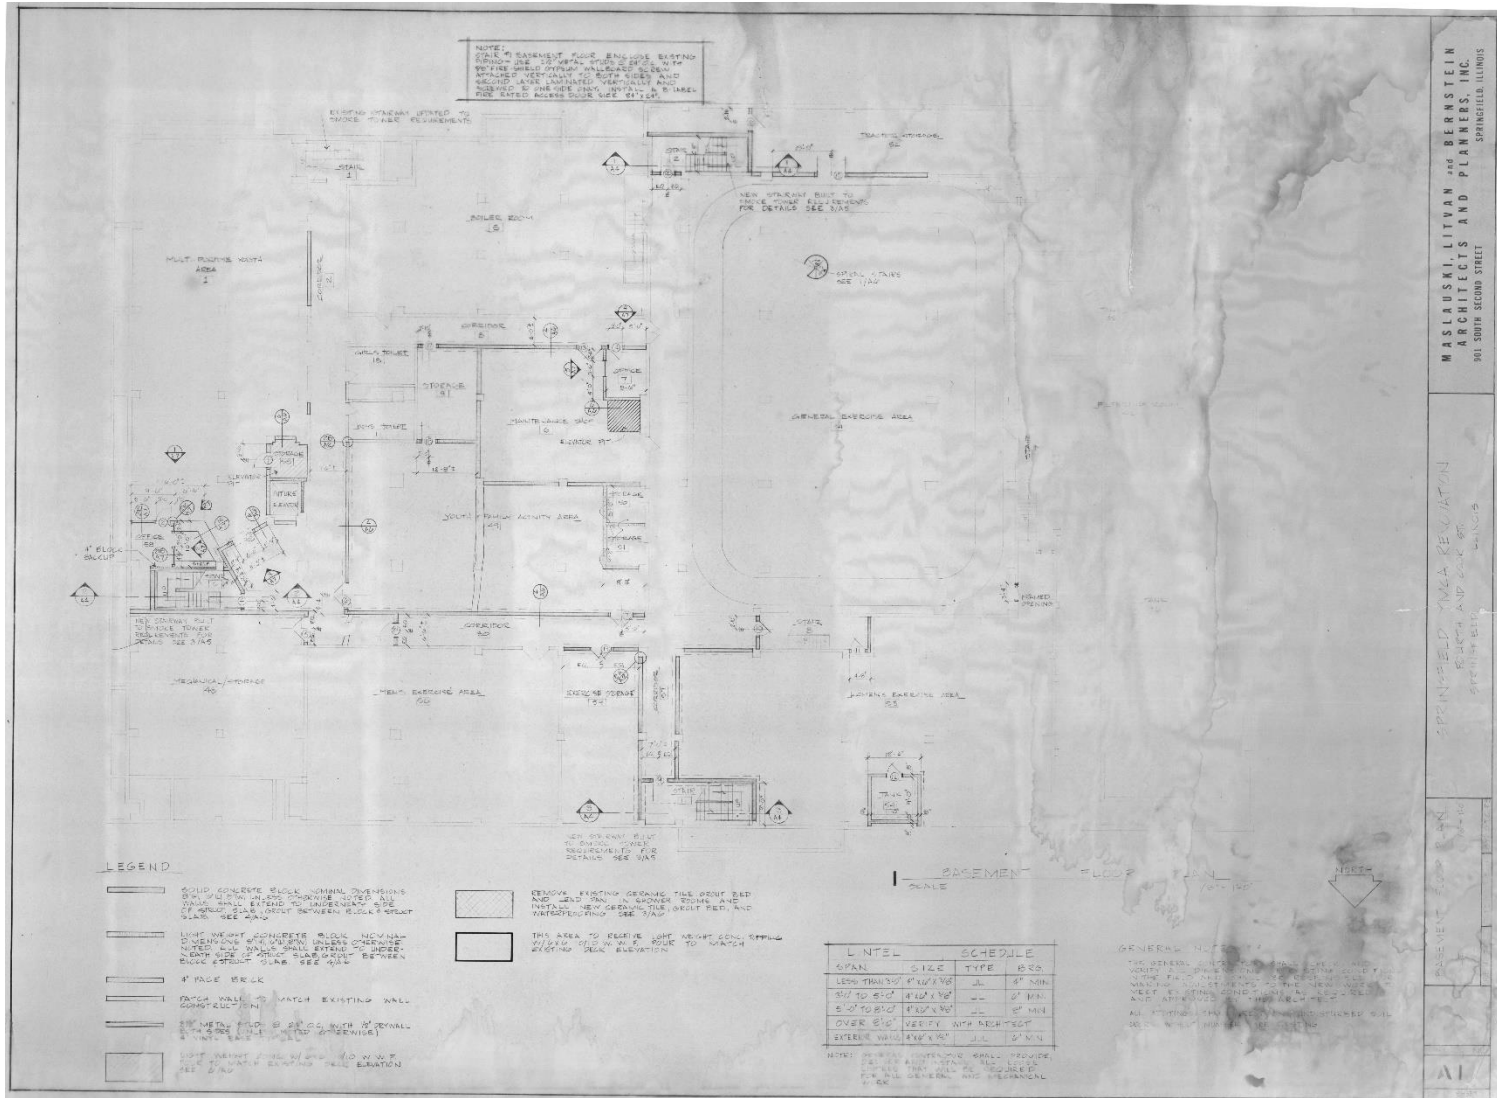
Basement Floor Plan, Springfield YMCA Renovation (Maslauski, Litvan and Bernstein 1975; Sheet No. A1). [December 8, 1975].
